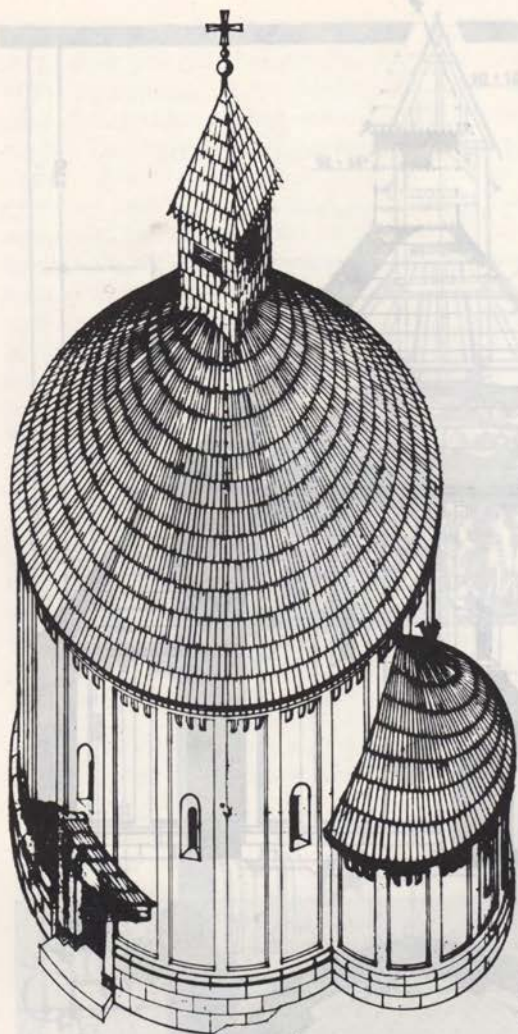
West front of the church with its tower and the reconstructed apse (Eng. Arch. N. Stupar-Sumi)
